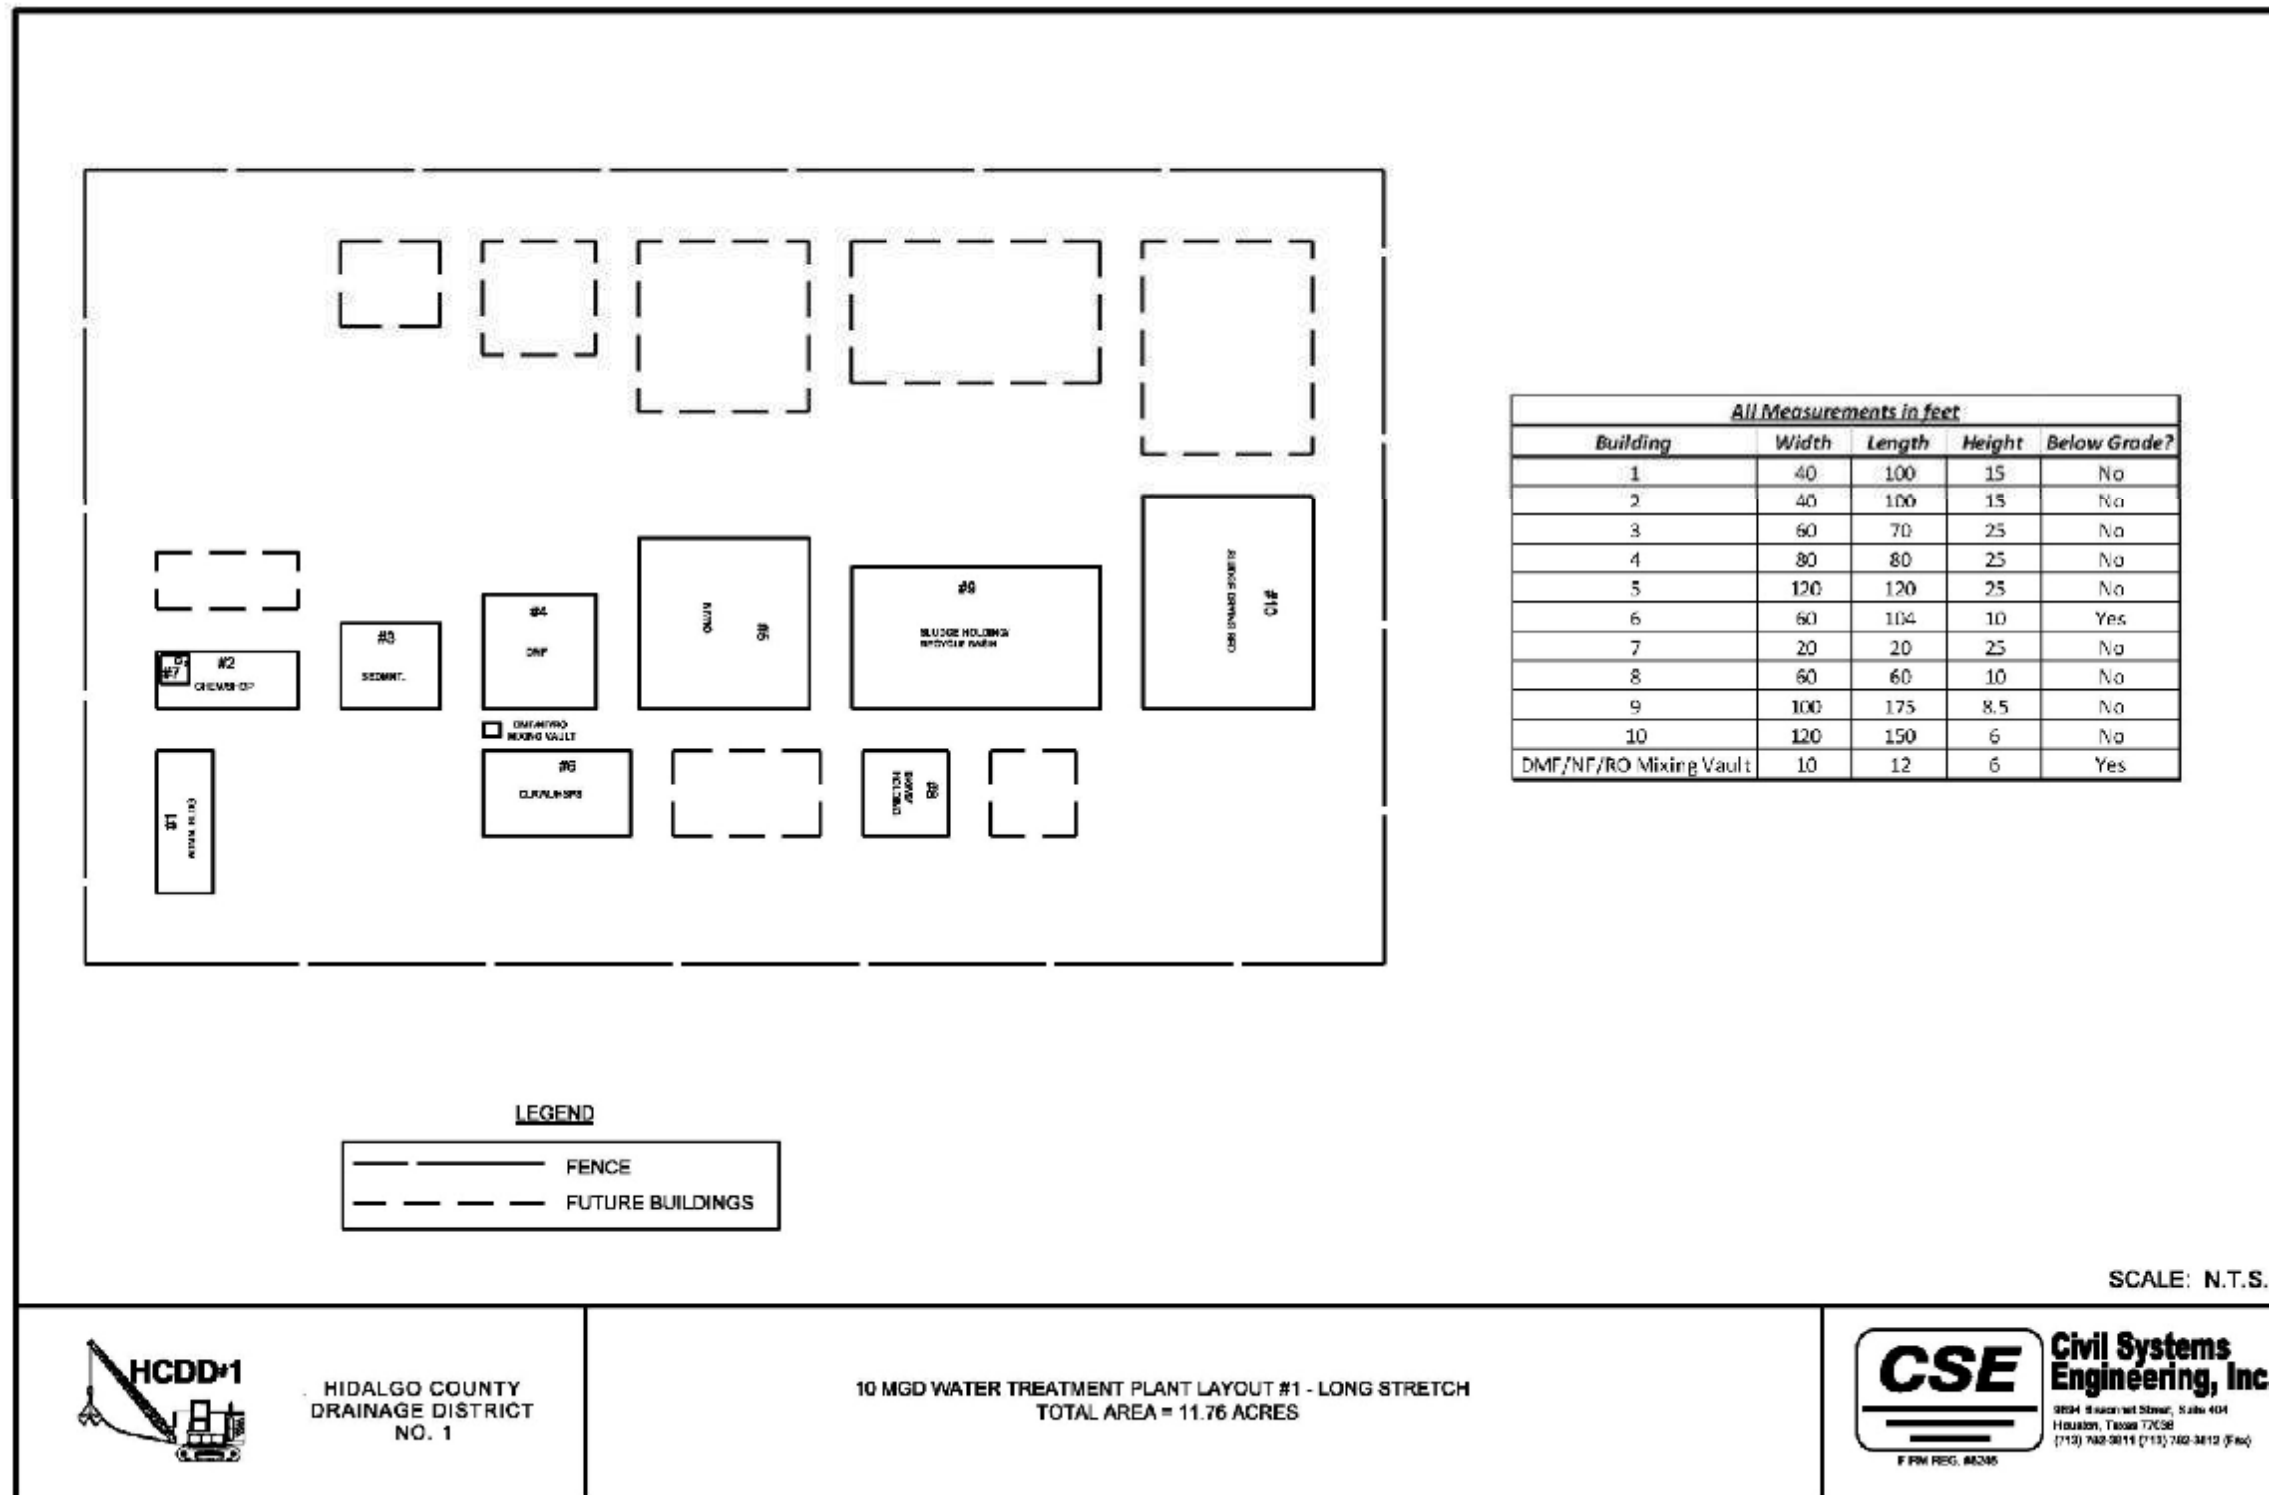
Water Treatment Plant Layout - Long Stretch
